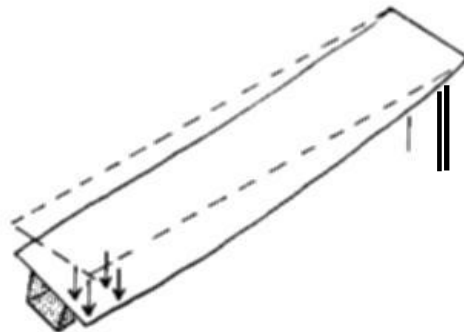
Because of the amount of workmanship needed to fabricate or shutter the transverse beams, this method of construction is becoming less popular and is being replaced by slab and beam-and-slab decks with no transverse diaphragms.
